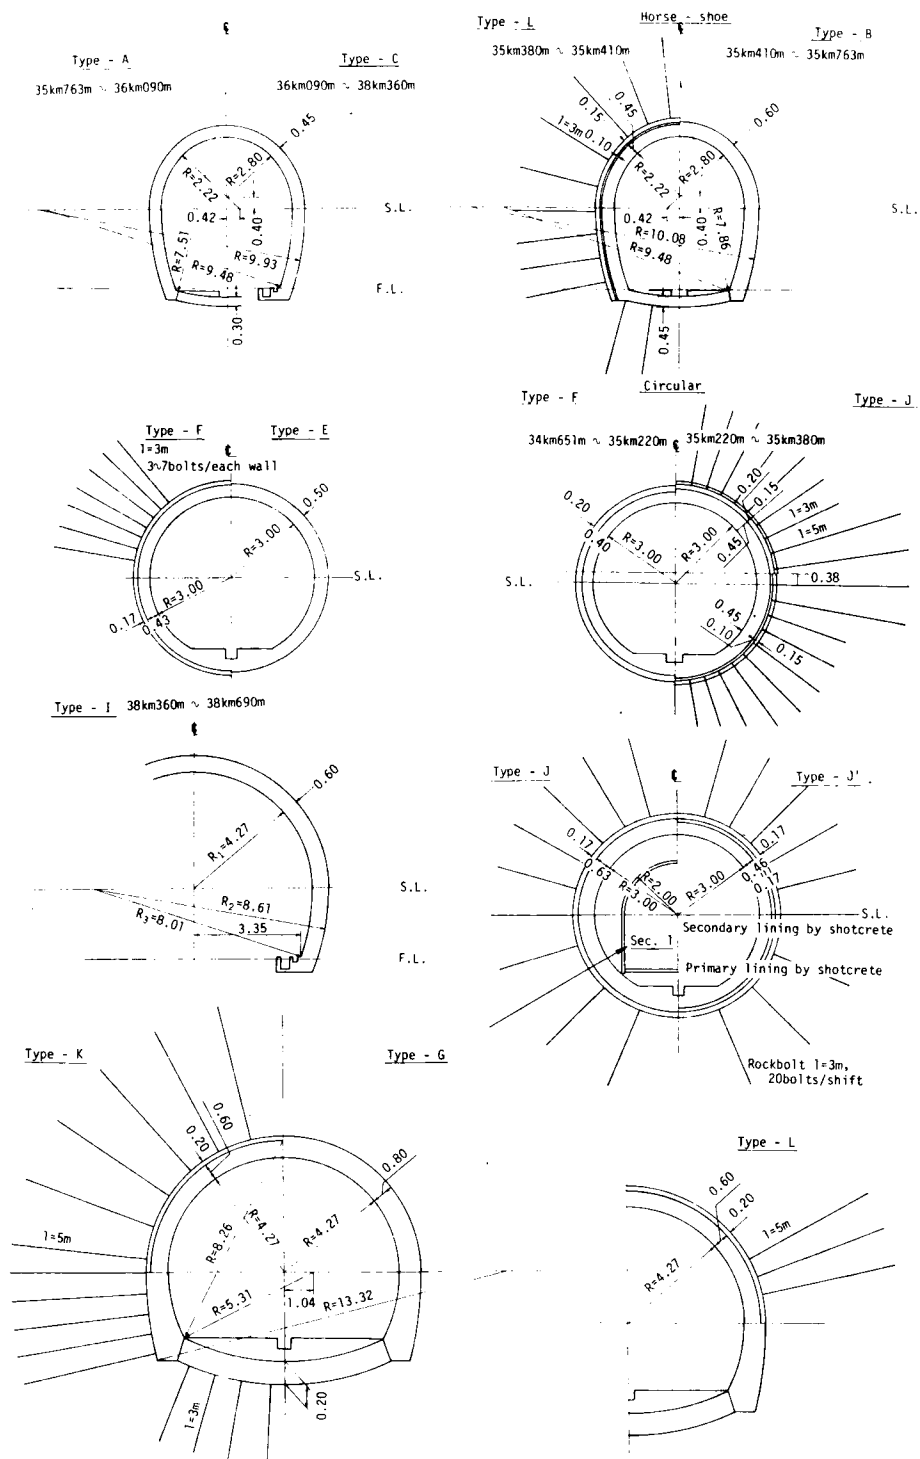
Cross Sections of Nabetachiyama Tunnel
